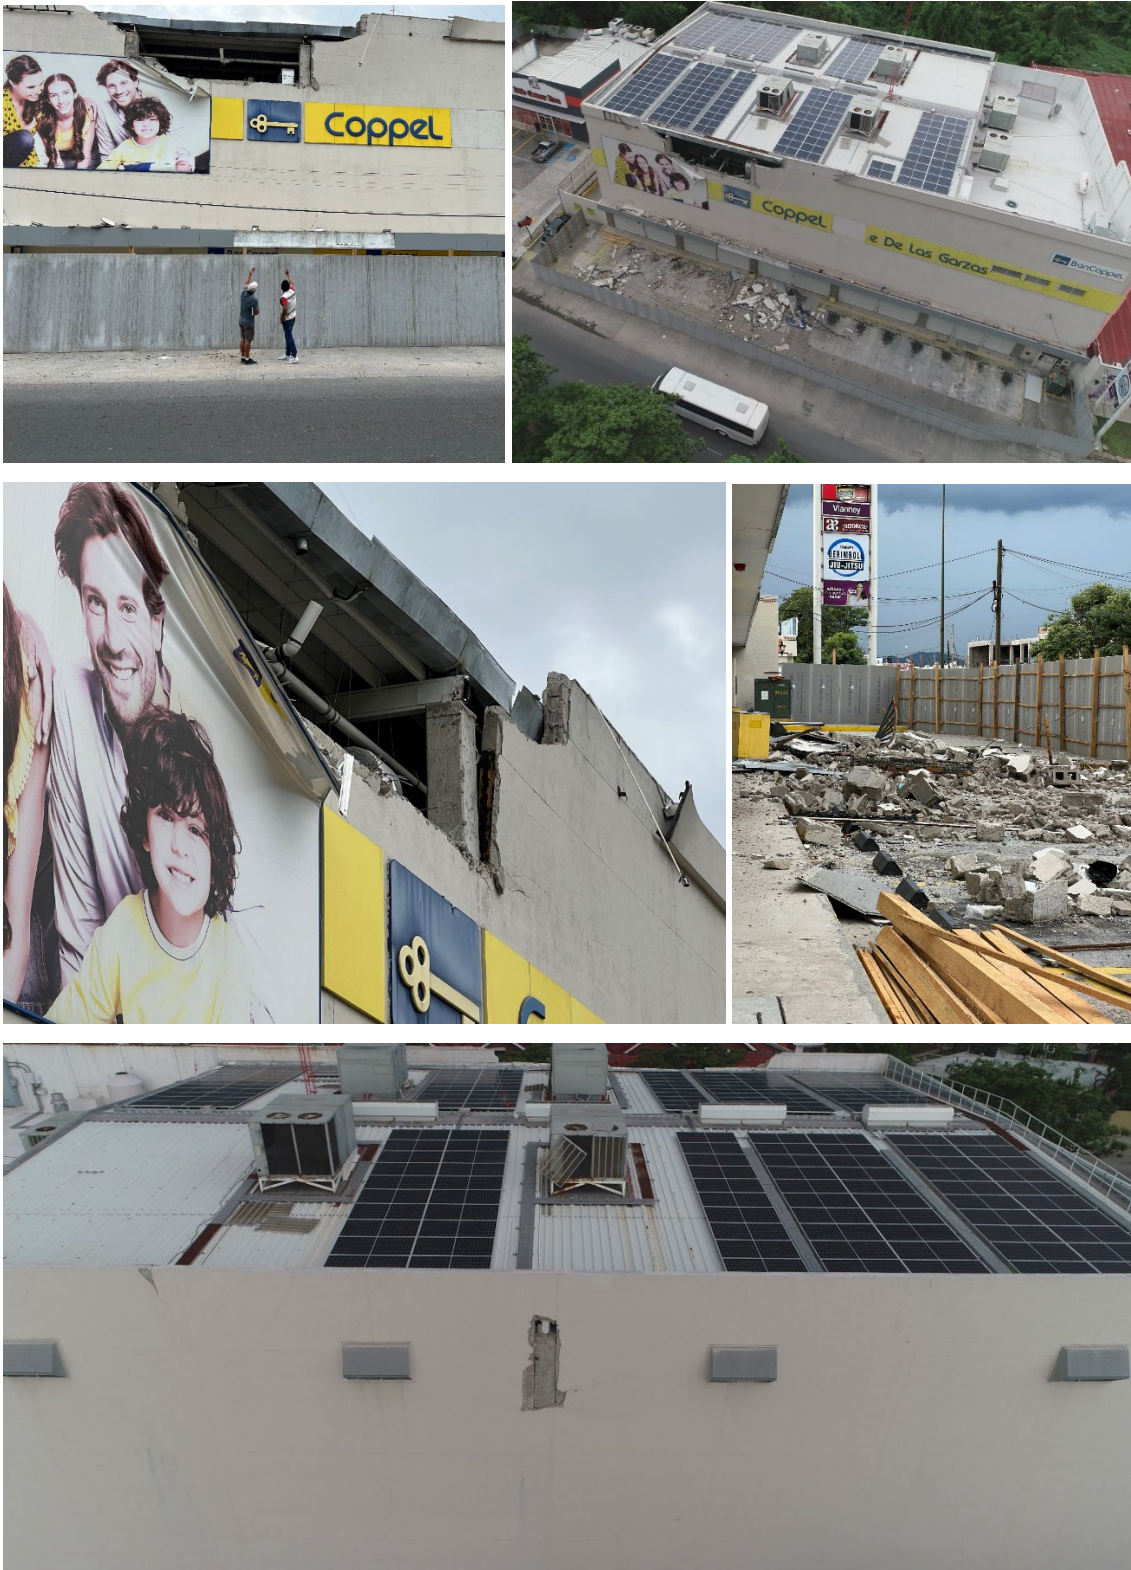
Collapse of third floor masonry walls of Coppel store, Manzanillo, Colima Waypoint Station 8 (Coordinates: 19.095606°, -104.302863°)
